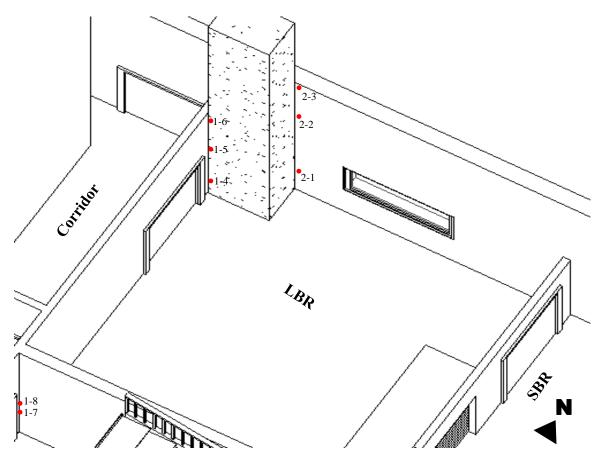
TC in the LBR column gaps and S wall cracks
